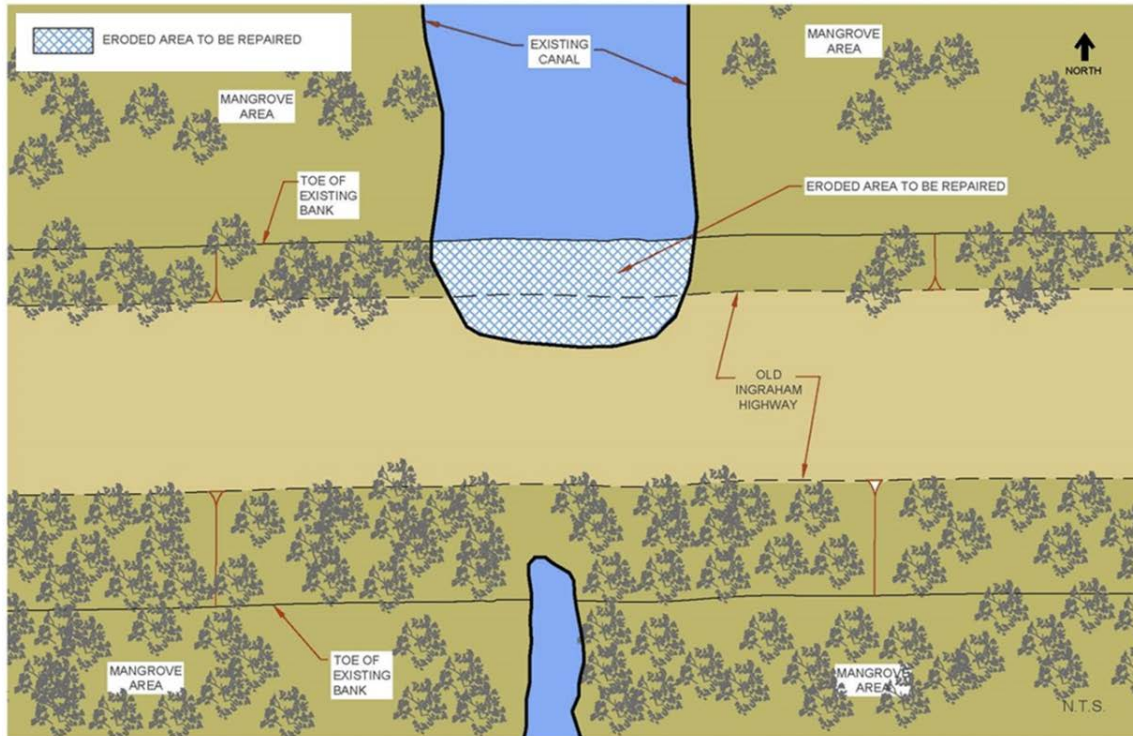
HOUSE DITCH: PLUG EROSION REPAIR PLAN
